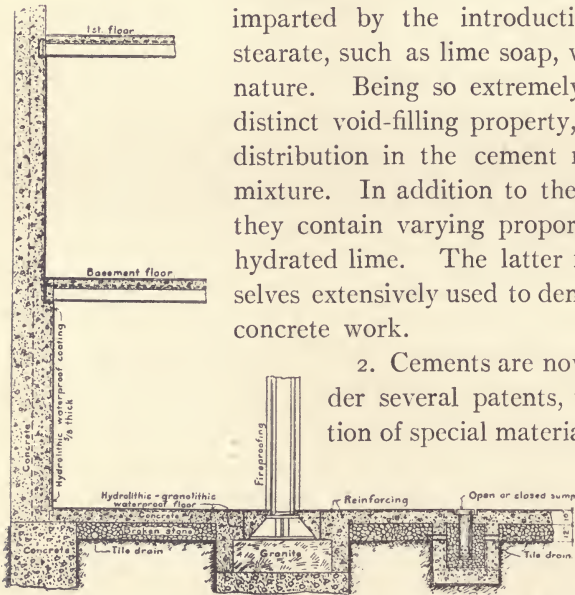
Section of Building Substructure showing the "Integral" Method of Waterproofing.
